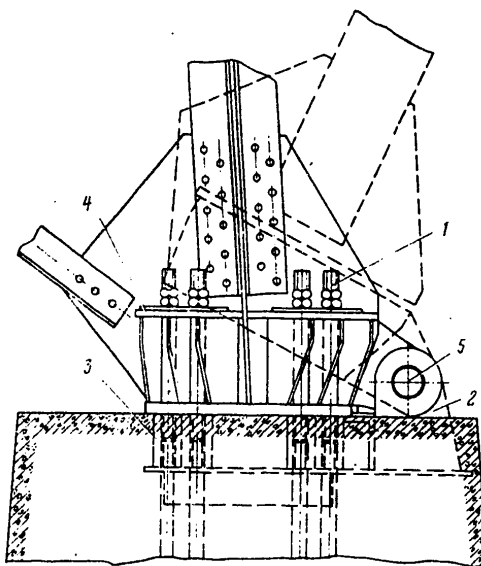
Construction of Pylon Foot with Erection Hinge Elements: 1--studs; 2--lower half of hinge; 3--connecting piece; 4--foot of tower with hinge element; 5--axis of hinge
